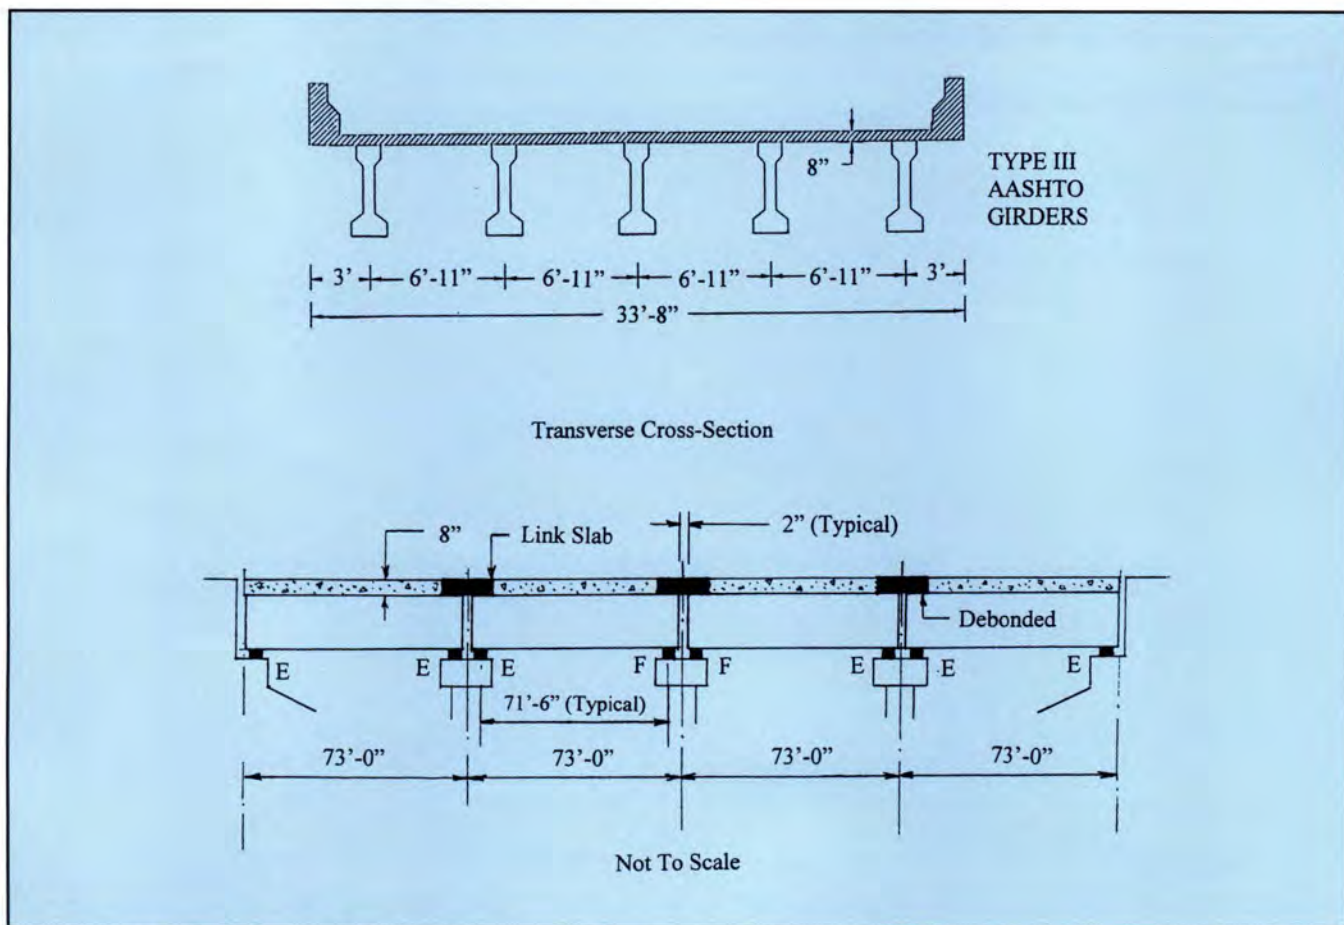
Cross-sectional views of bridge for design examples. Note: 1 in. = 25.4 mm.
